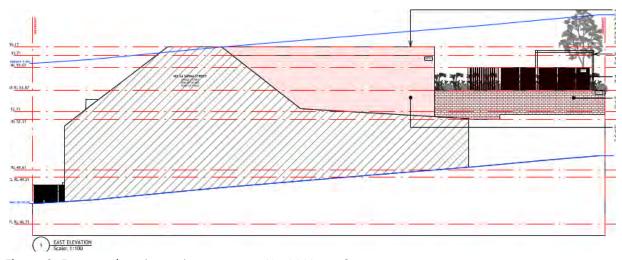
Eastern elevation as it presents to No.44 Varna Street
